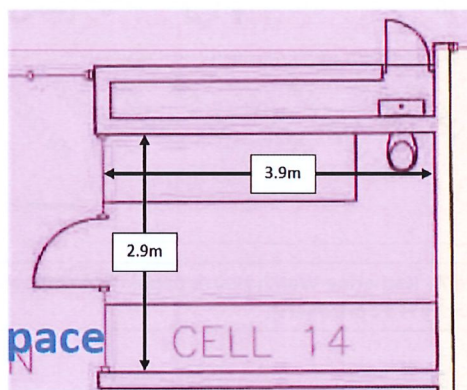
Layout of cell 14 with measurements. Floor plan provided by NT Police.
